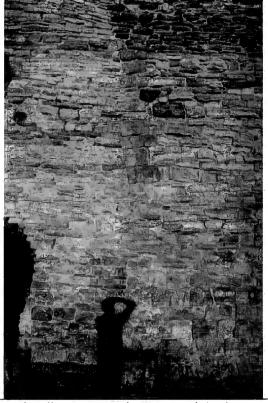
The Junction of Walling Between the Tower and the Curtain Wall at Richmond
